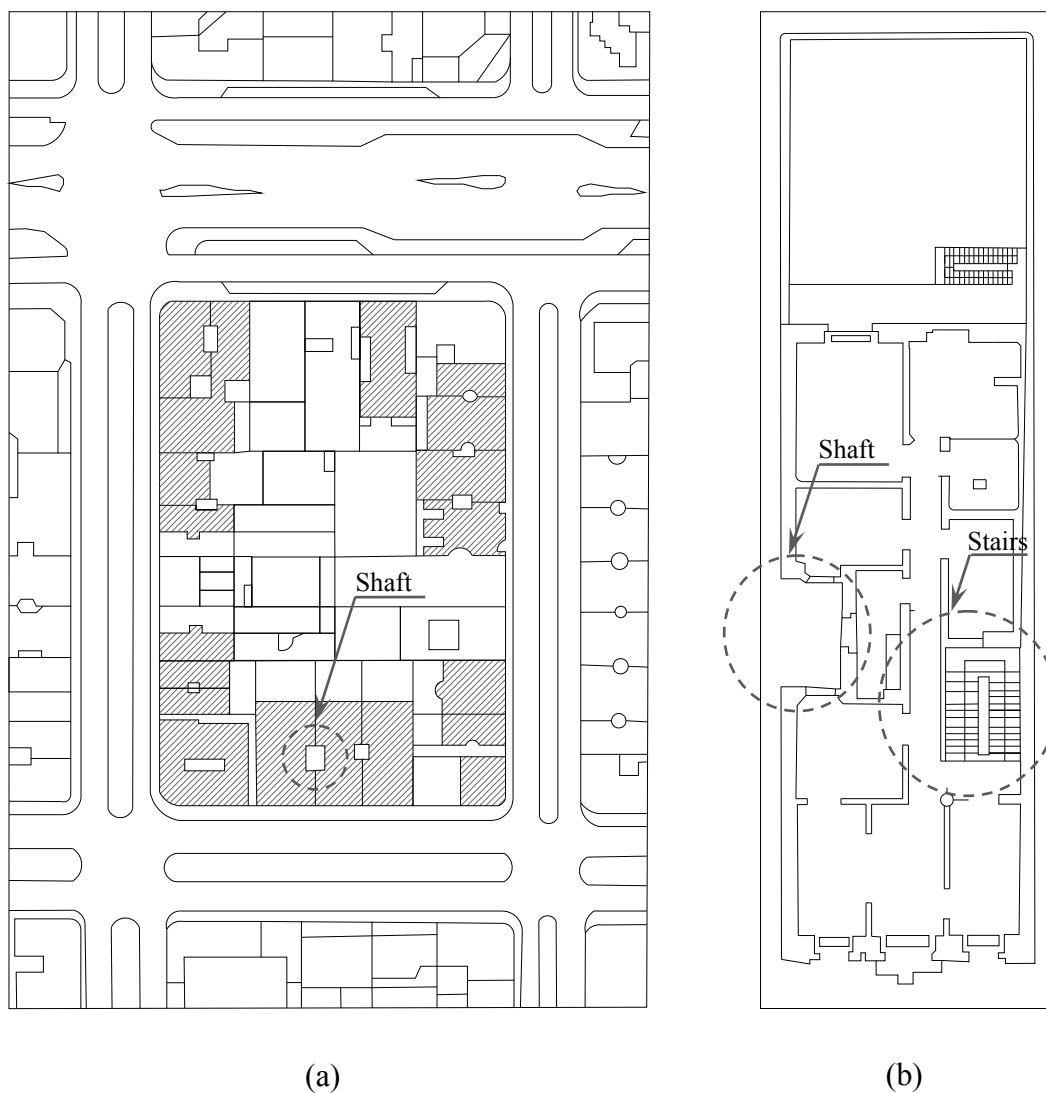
Urban layout and apartment plan of “gaioleiro” buildings: (a) block of buildings; (b) geometry of the typical apartment.
